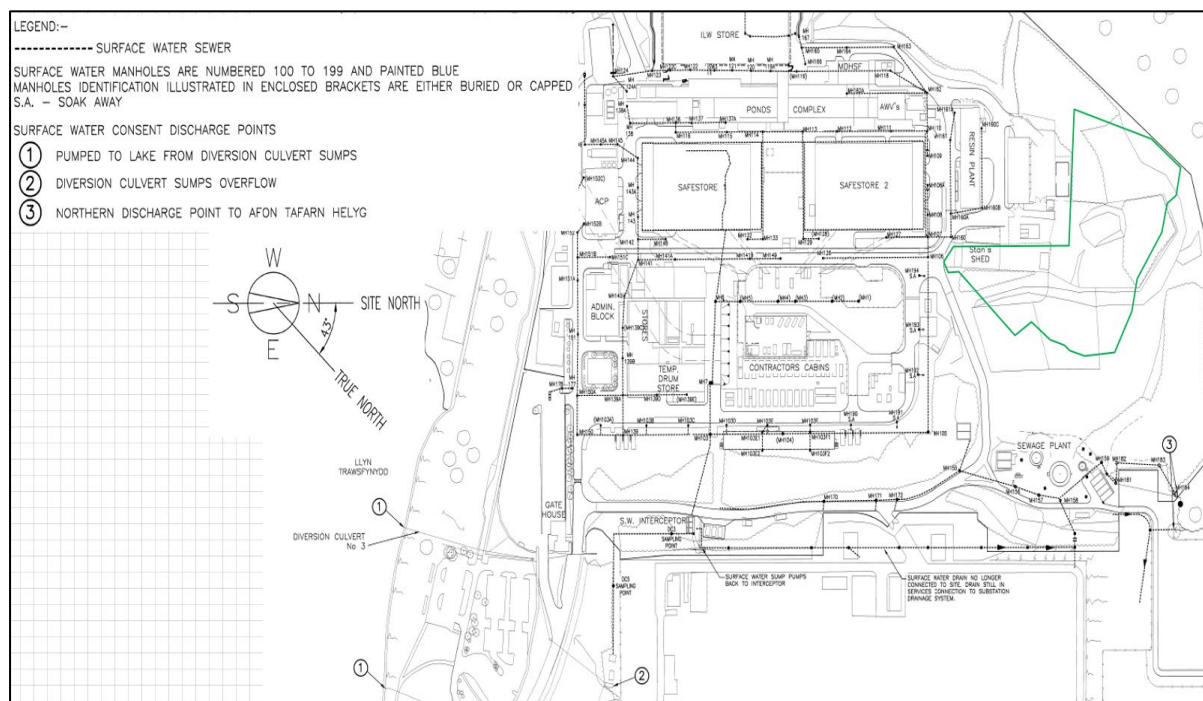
Site drainage plan (DfR permit boundary is shown in green)
